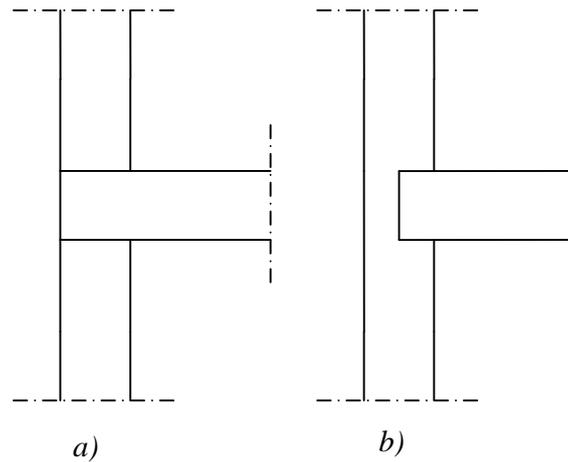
Two solutions on how a wall and a slab can be cast, a) the walls are cast in two steps, b) the wall are cast with an indented joint in one piece. Solution b) is a more effective solution and water proof.
